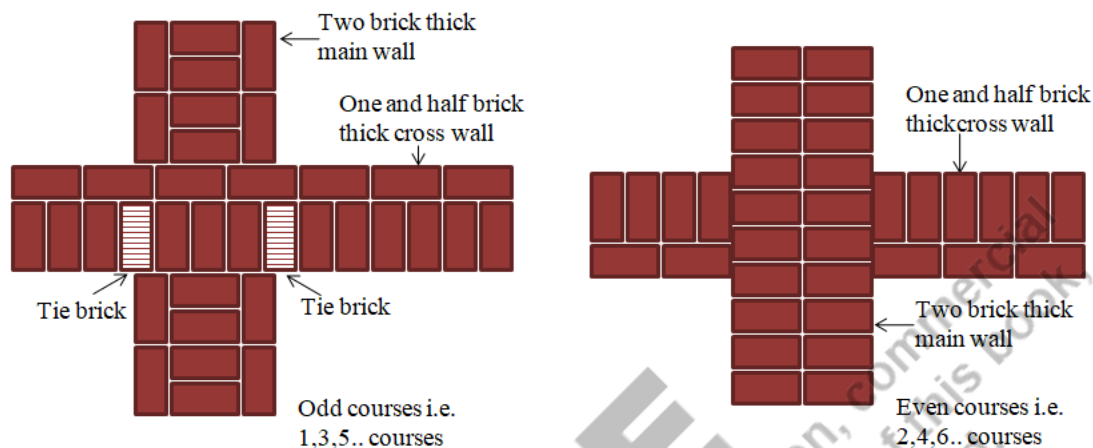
(c) Cross junction between two one and a half brick thick wall and two brick thick wall
